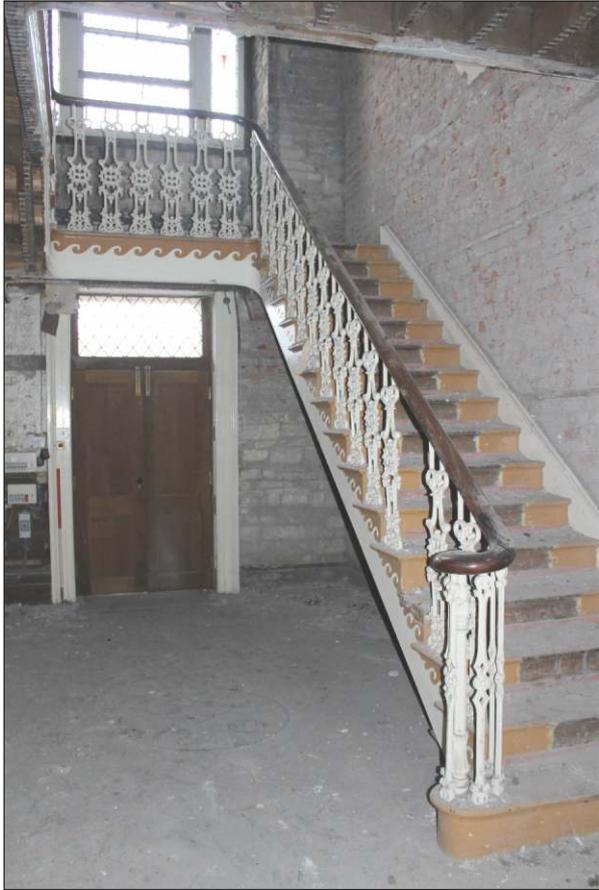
Room 2, main staircase and central hall. View to northwest (scale 1m)
